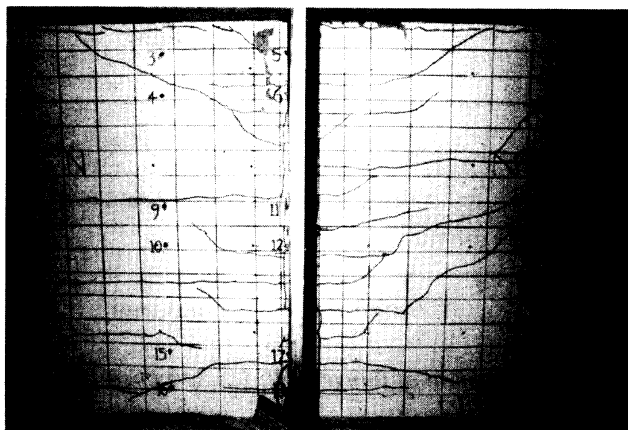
Web wall at failure: (a) Specimen DP1; and (b) Specimen DP2.
